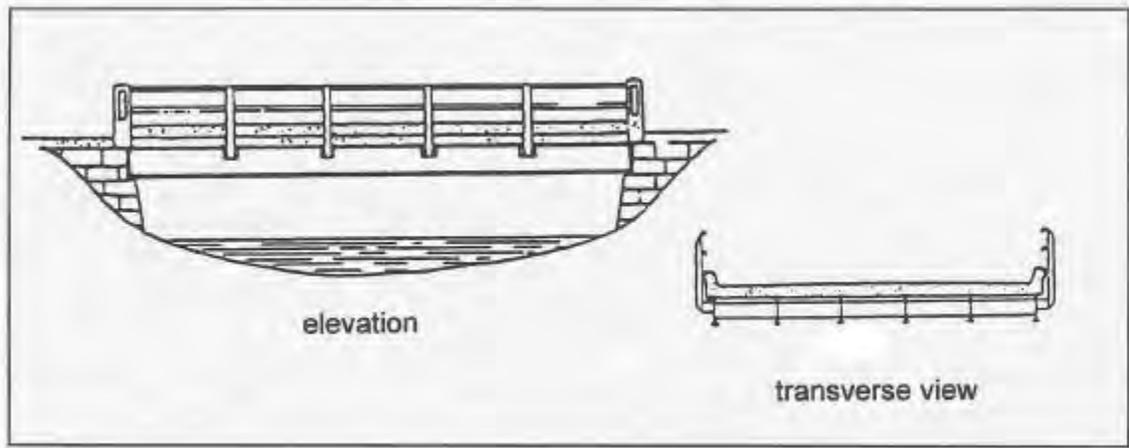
Steel beam, elevation and transverse view (Source: Carver N.D.).
